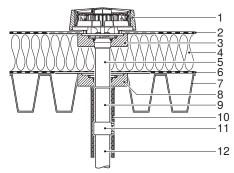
Installation in a lightweight roof insulated with bitumen roof foil
